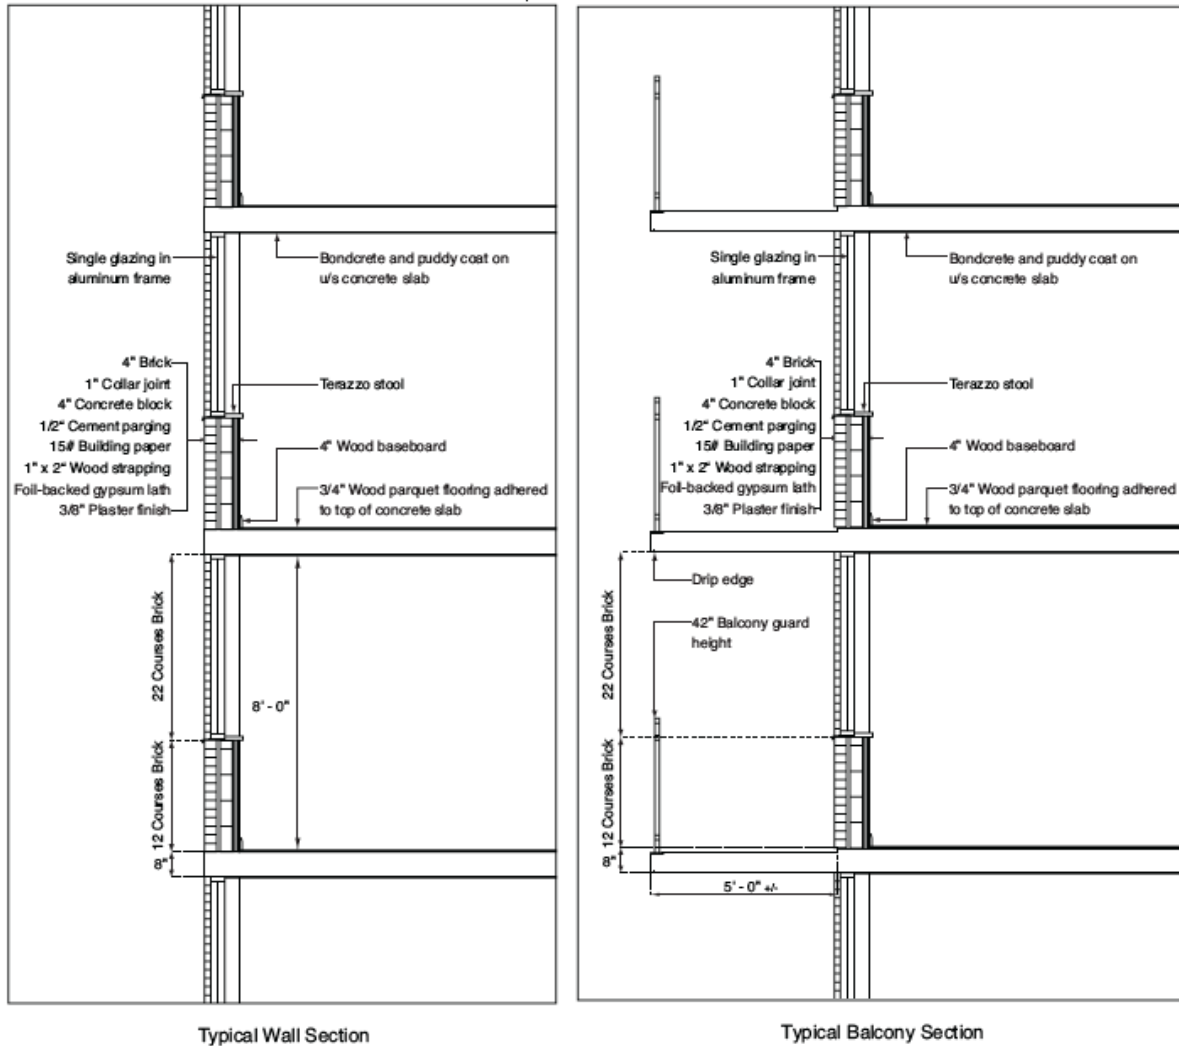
Existing structure of concrete towers: exposed slab edges (left) and balconies (right)
